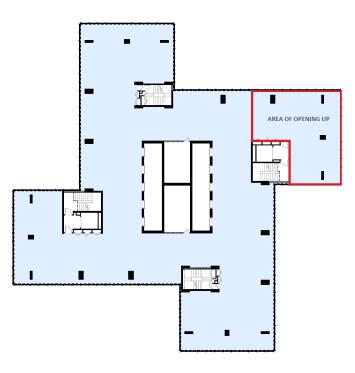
Existing typical floor plan. The spurs are known as North, East, South and West (image courtesy of 190925 ARUP Invasive Survey Report)
